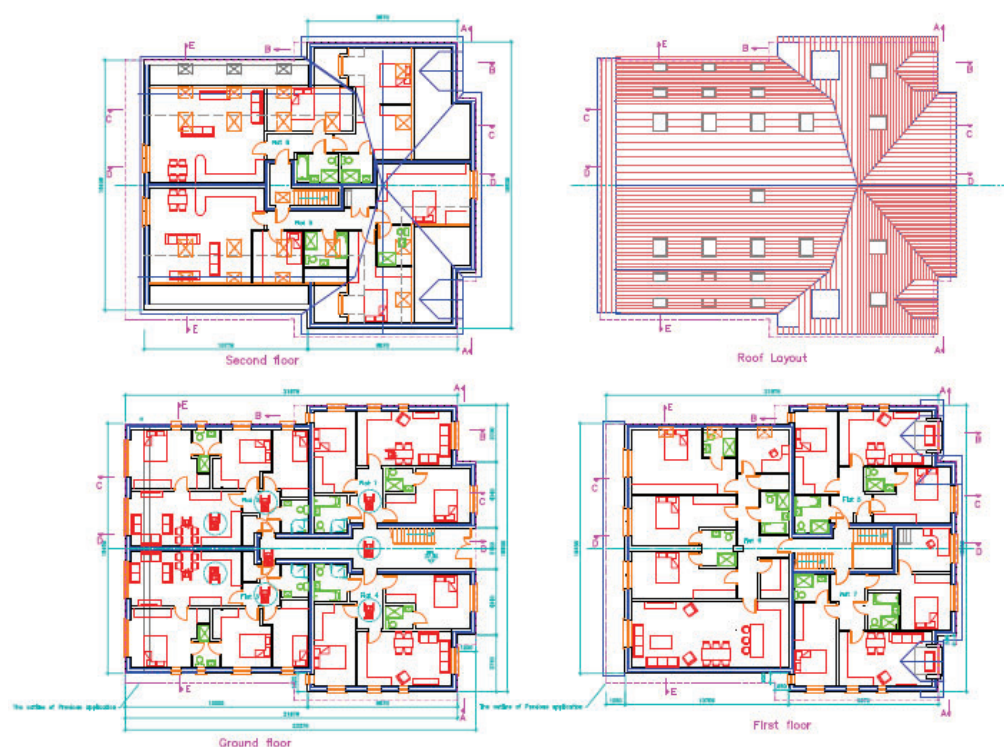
Proposed floor plans (please note – larger version of plan can be found in the Committee Plan Pack)
